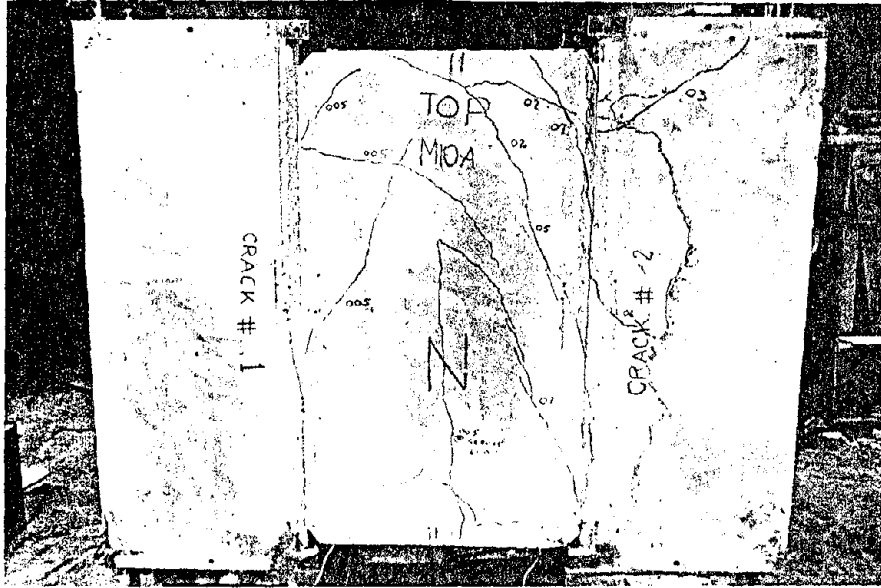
Typical appearance of a monotonic loading specimen after failure
